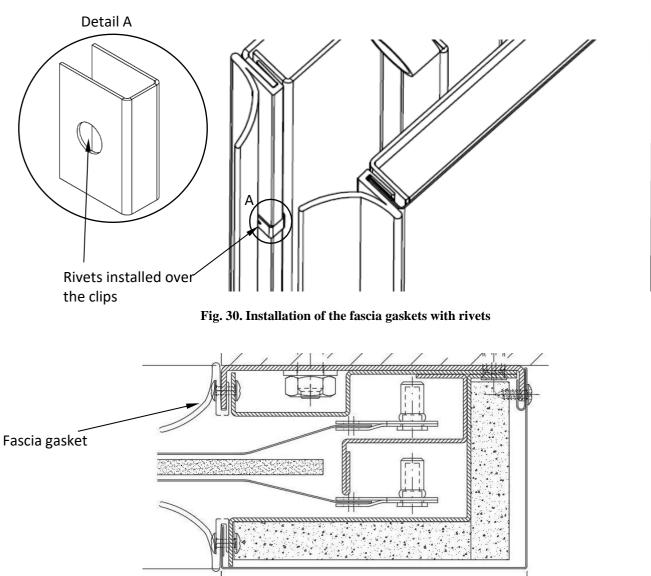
Cross-sectional view of a guide rail with the fascia gaskets secured with riveted clips
